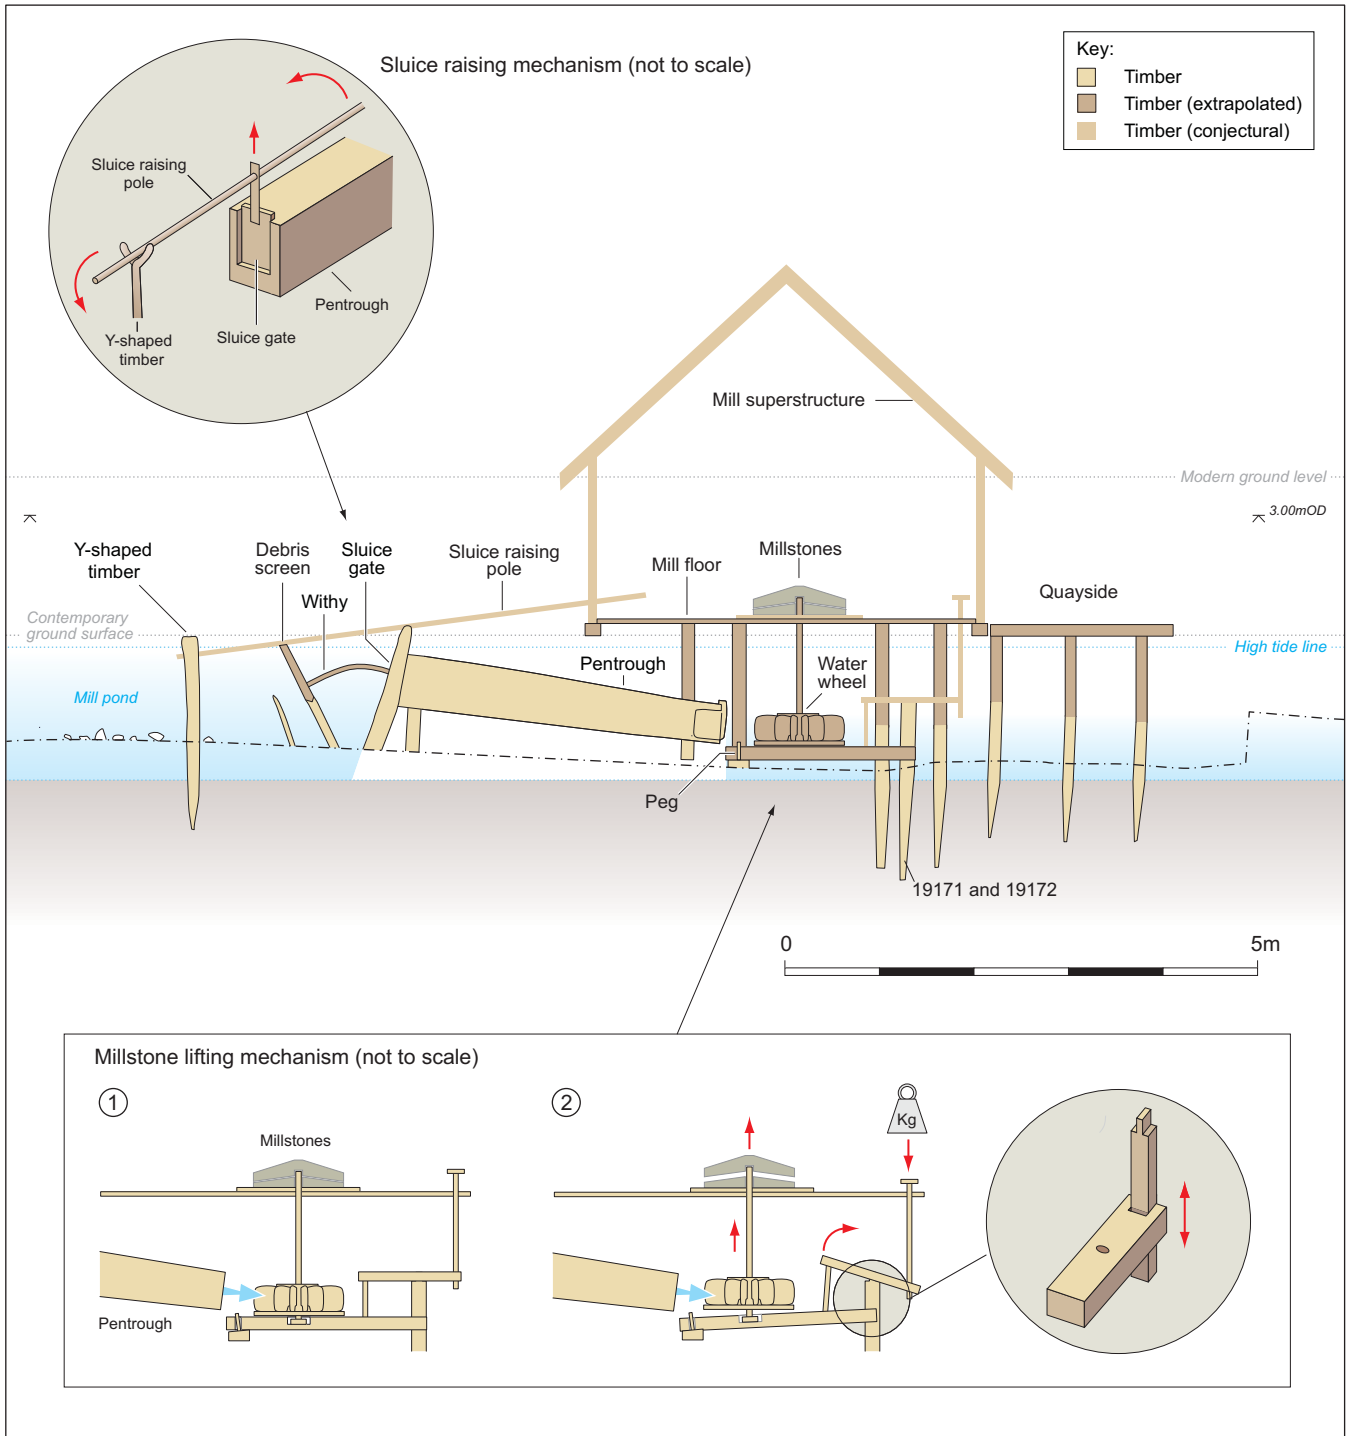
Conjectural reconstruction elevation of mill, showing possible lightening mechanism
